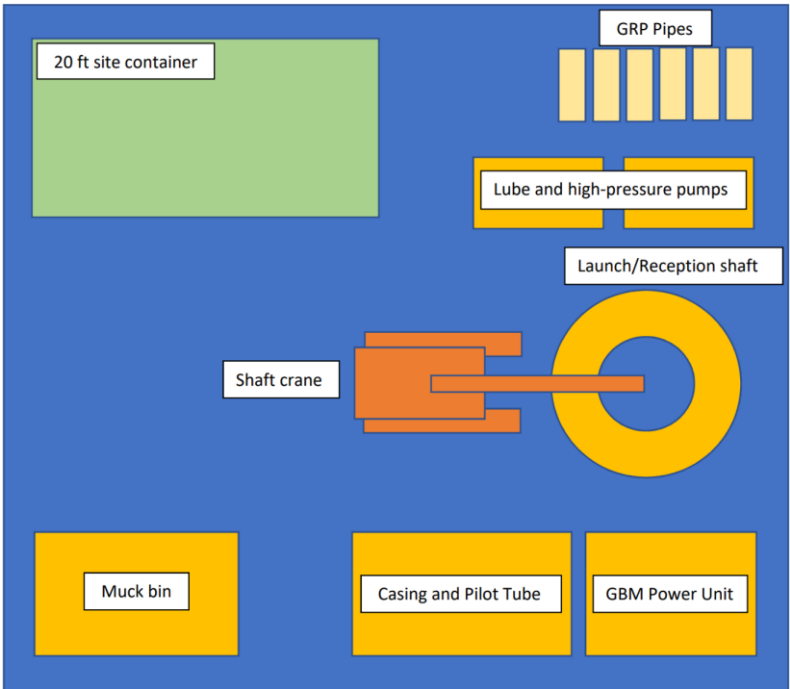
Approximate layout of the Tamiro Road stormwater embankment trenchless construction laydown area
